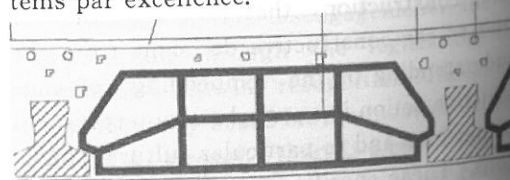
Precast concrete beam slab © Monica Alcindor Huelva
